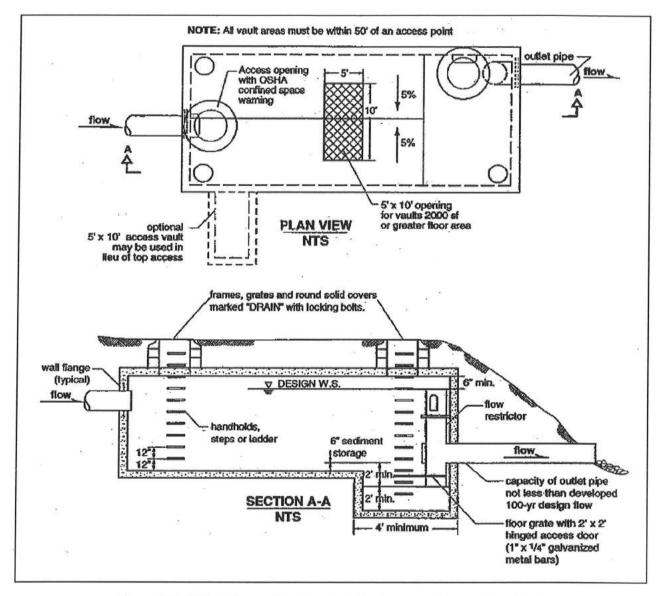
Schematic of Typical Underground Detention Vault (Source: WDE, 2000)
